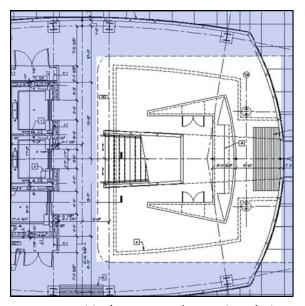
Lobby/ Main Stair | First Floor | Floor Plan
